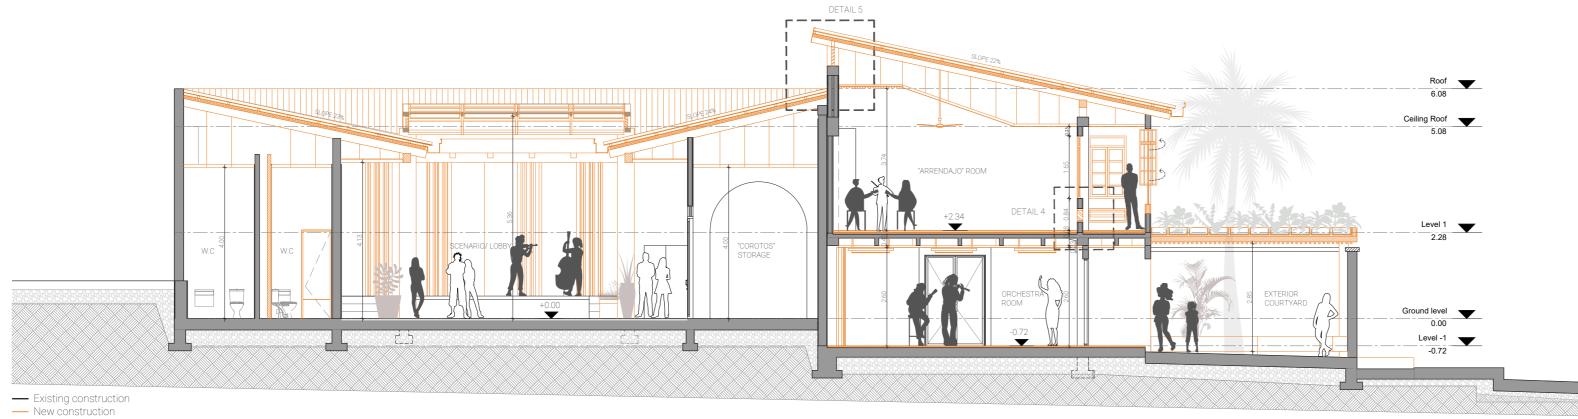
Section C 1:100 / Source: Author's elaboration
